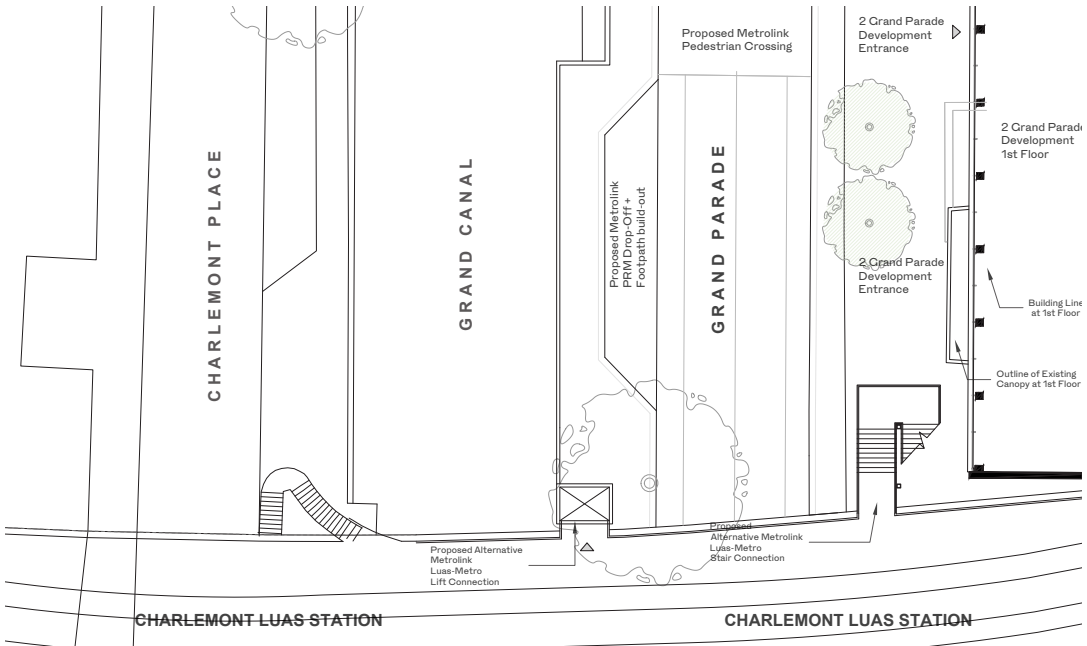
E Proposed design intent at first floor for the reconfigured stair and lift.
